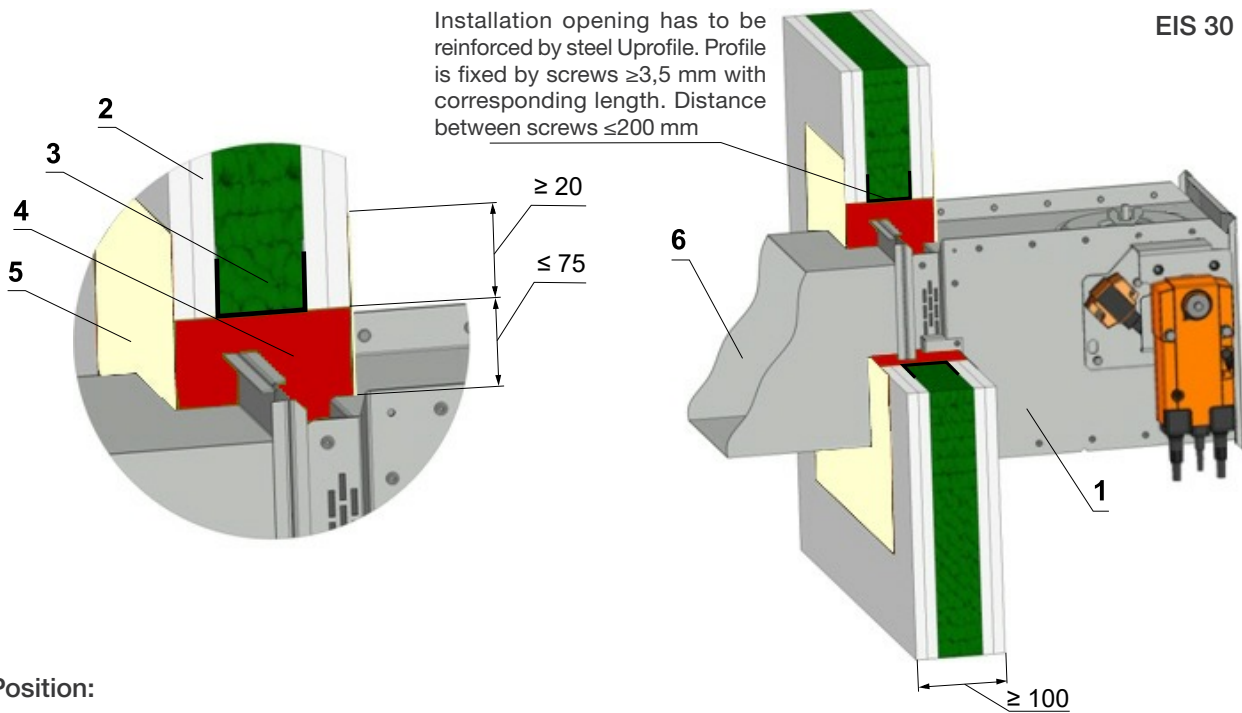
Gypsum wall construction - fire protection foam with stucco plaster
